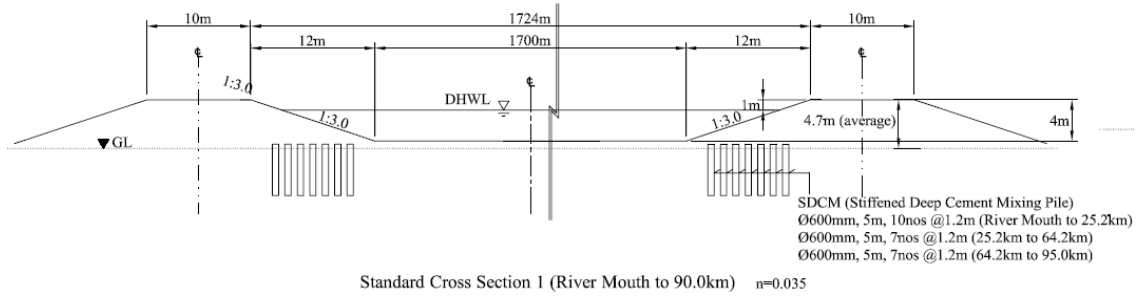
Standard Cross Section of East Diversion Channel with Slope Protection (0km to 94km)
